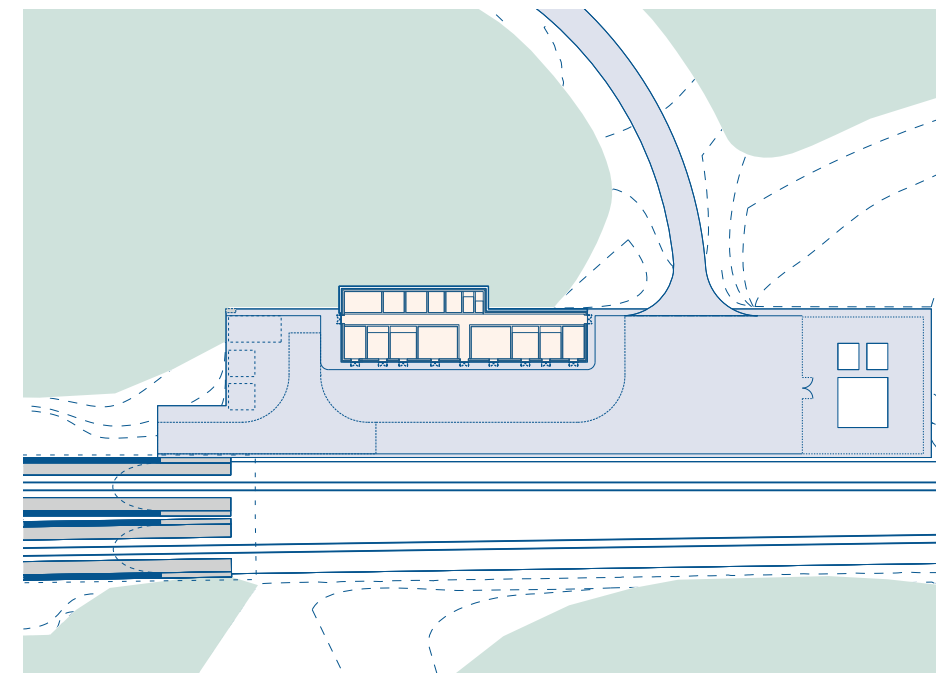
\_ Site plan - Semi-buried L-shaped building footprint
